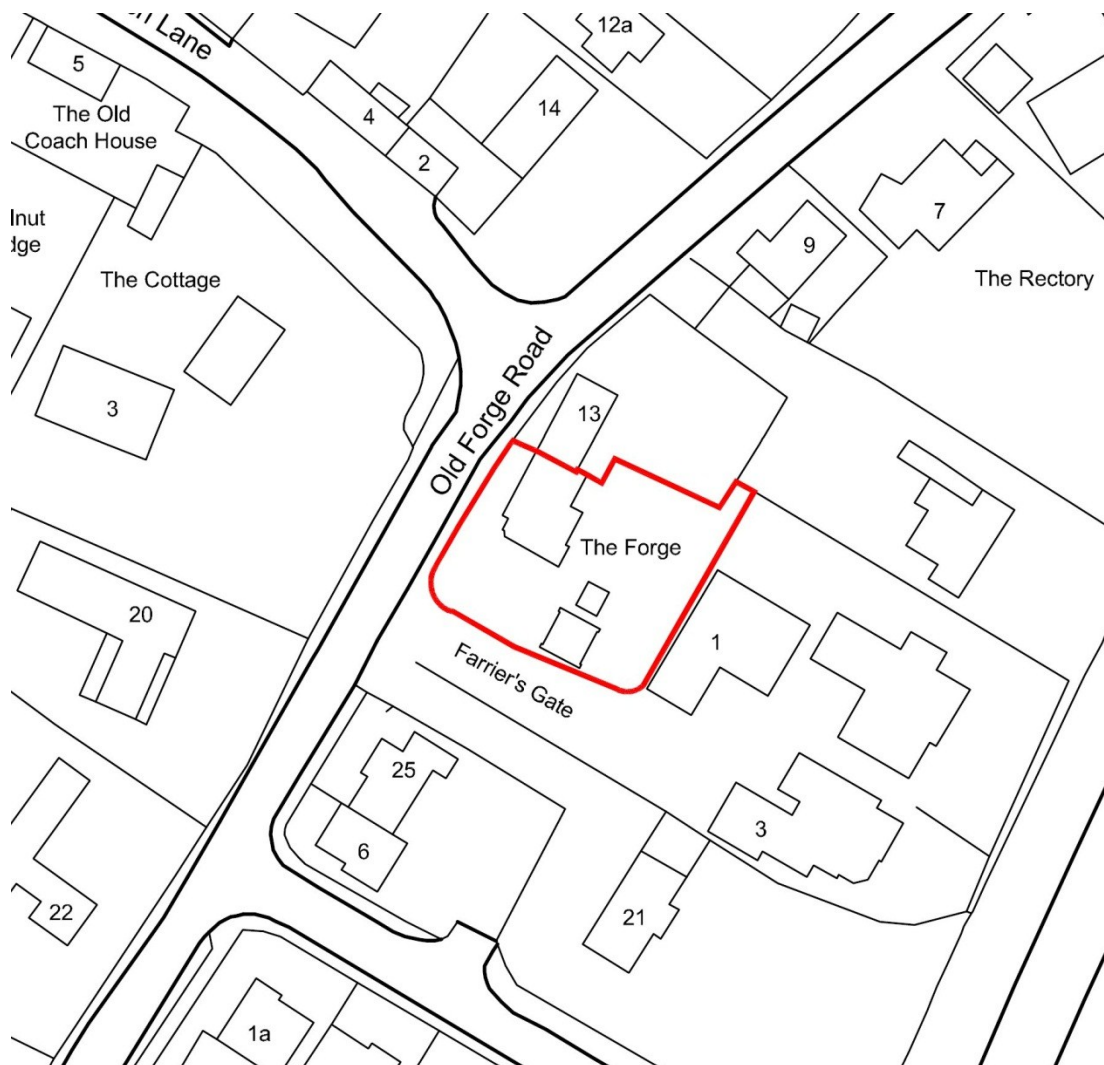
Site location plan. Scale 1: 1250. Provided by developer
